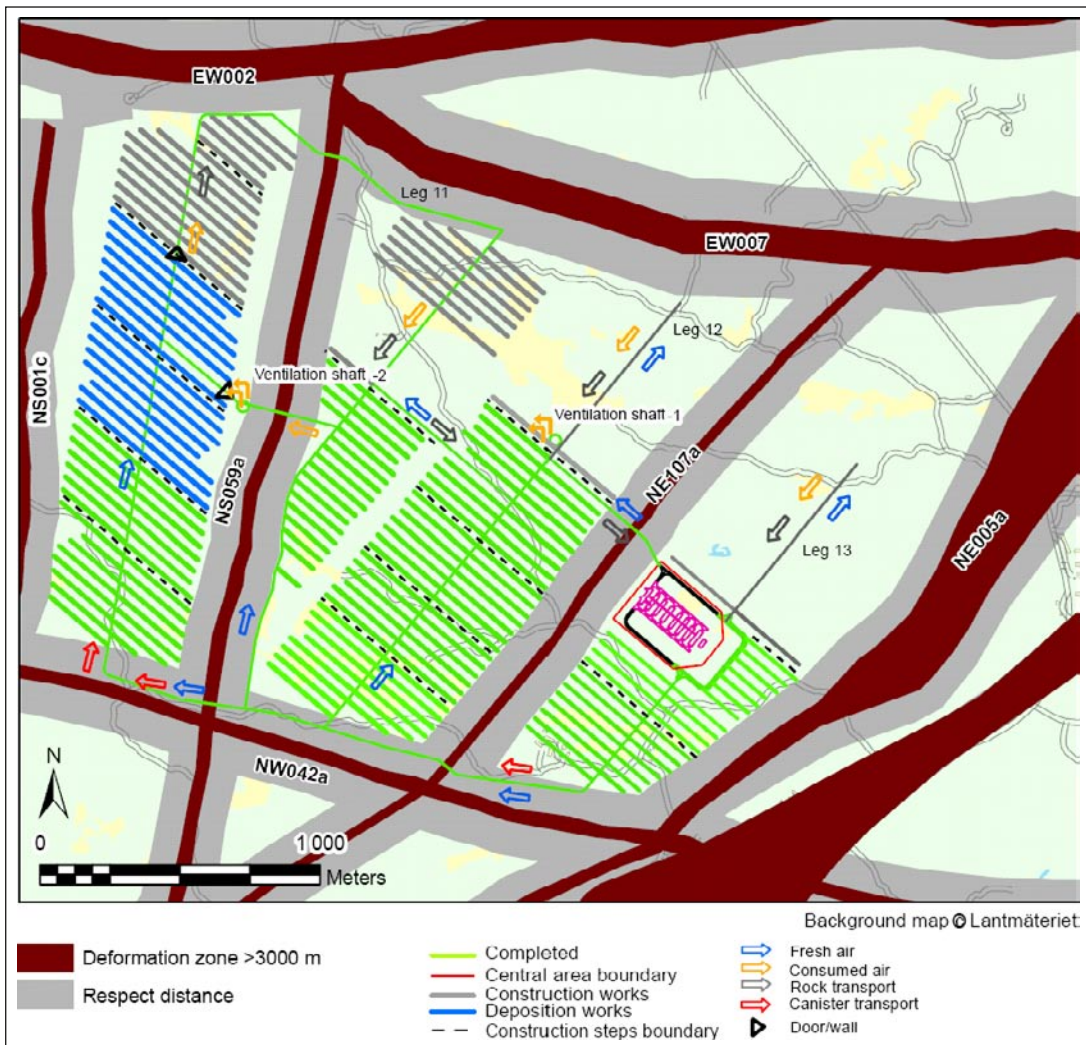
Excavation in leg 12 and 13 and in construction step 13 and deposition works in construction step 11.
